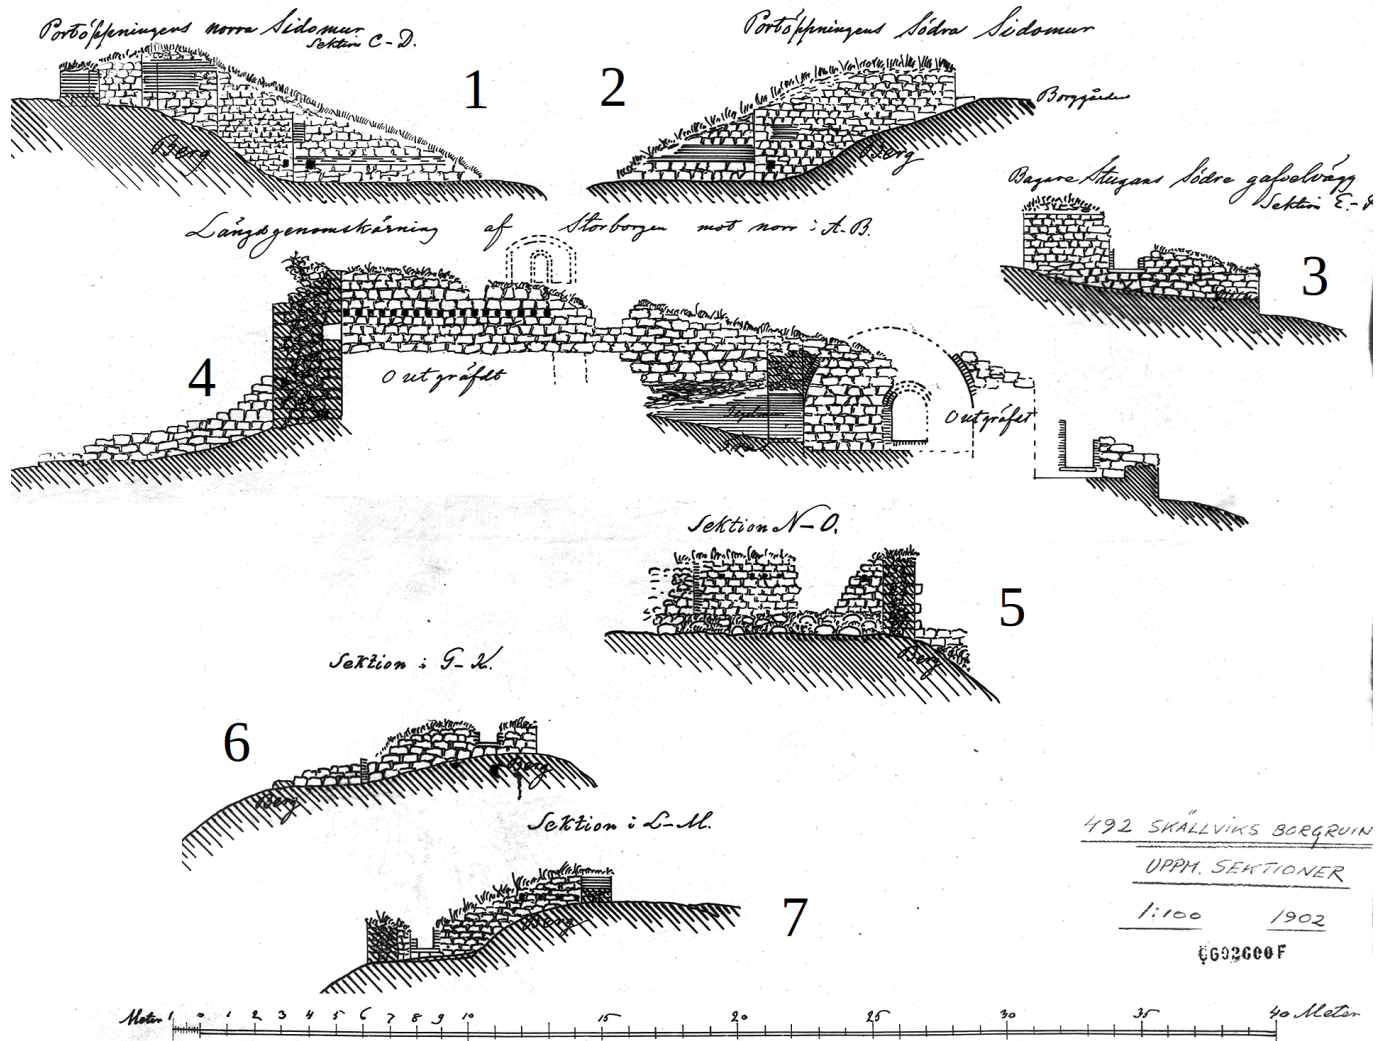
Architect August Waldemar Lundberg's 1902 section and elevation drawings of Skällvik Castle. ATA. 1. III Gatehouse, internal elevation of N wall. 2. III Gatehouse, internal elevation of S wall. 3. IV Bakery, external elevation of S wall. 4. I Main Building, W-E section and internal elevation of N wall. 5. IX, internal elevation of S wall. 6. VIII, external elevation of S wall. 7. Not identified on plan.
